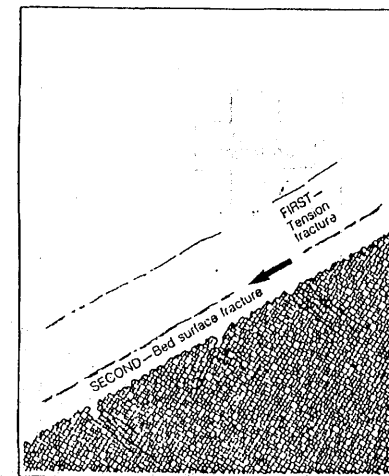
Initial failure may occur as a tension crack. The opening of the tension crack would induce shear fracture at the bed surface.
